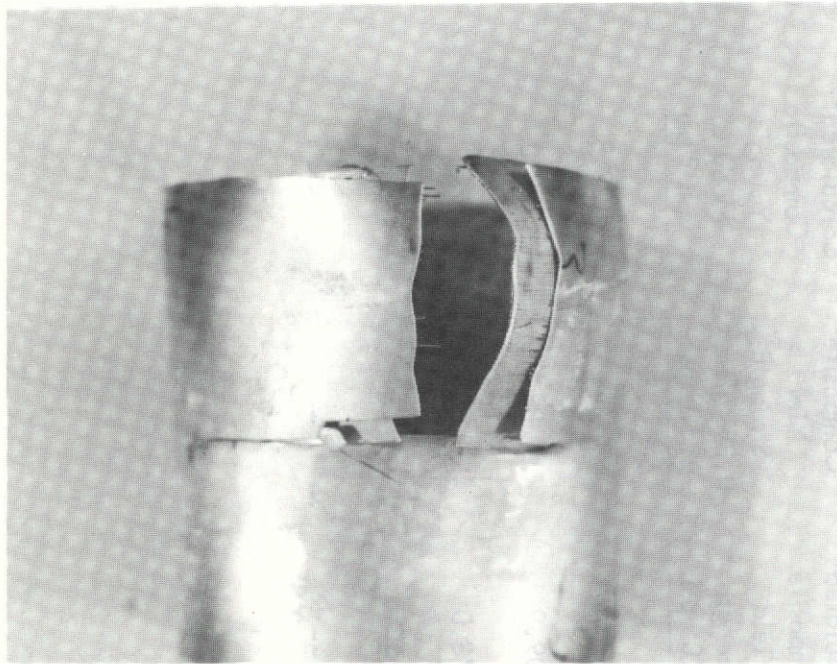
Fracture Surface of Wire Wrapped Cylinder No. 9
